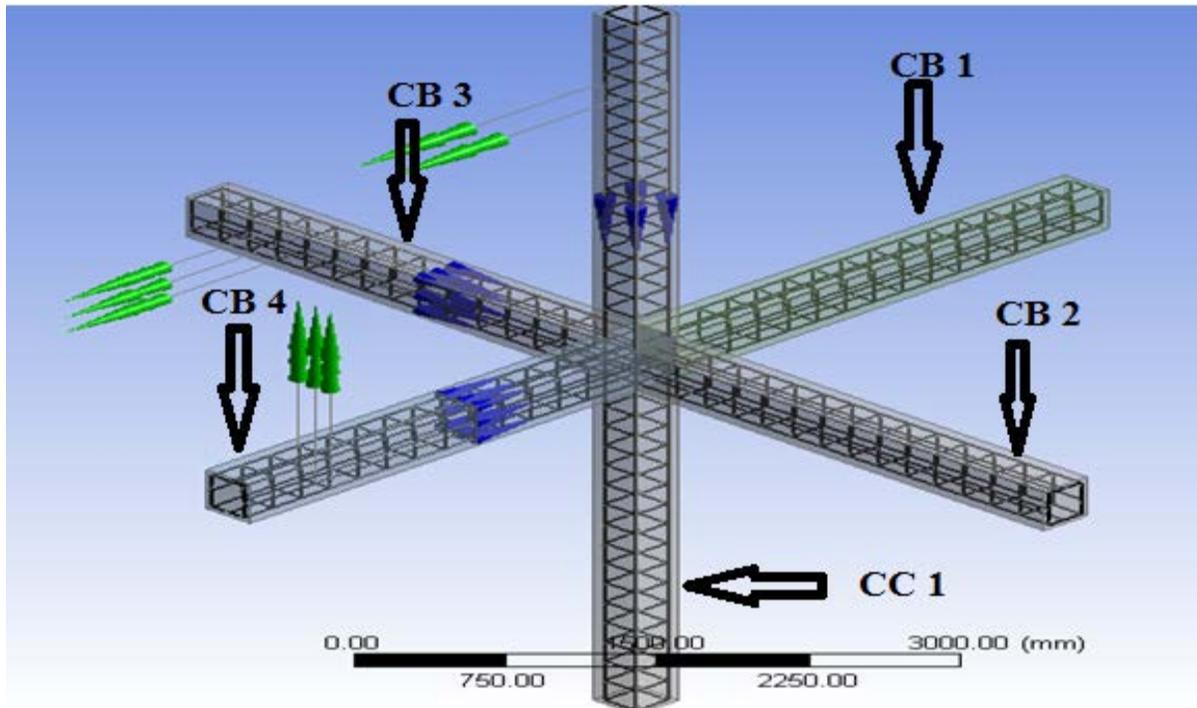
Geometric model and reinforcement detailing of interior joint (CS4)
